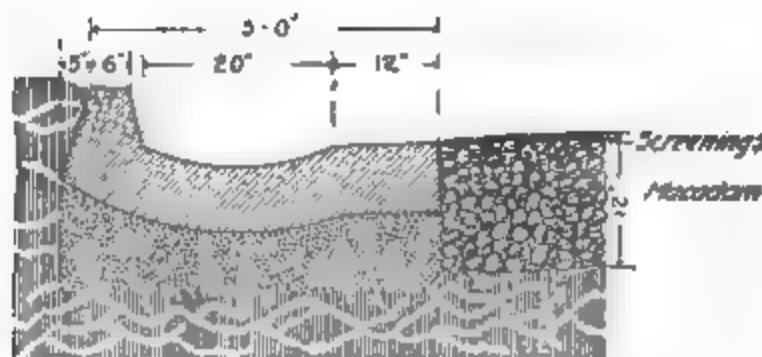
ST. LOUIS CONCRETE CURB AND GUTTER.
